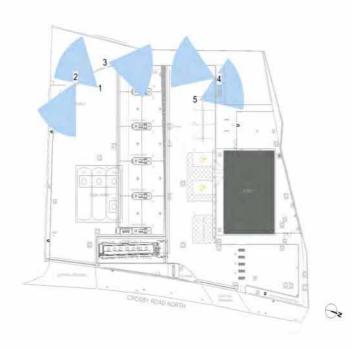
Site plan identifying photo locations - (Source - Jennings Design - Not to a specified scale)
